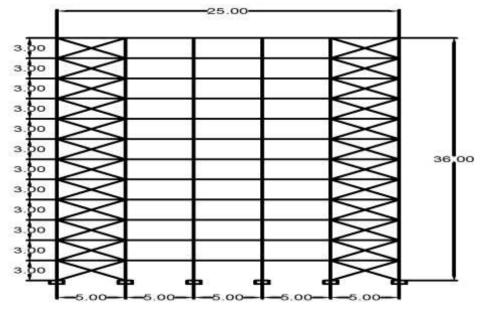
Elevation of 12 storey building with X-bracing in longitudinal direction
